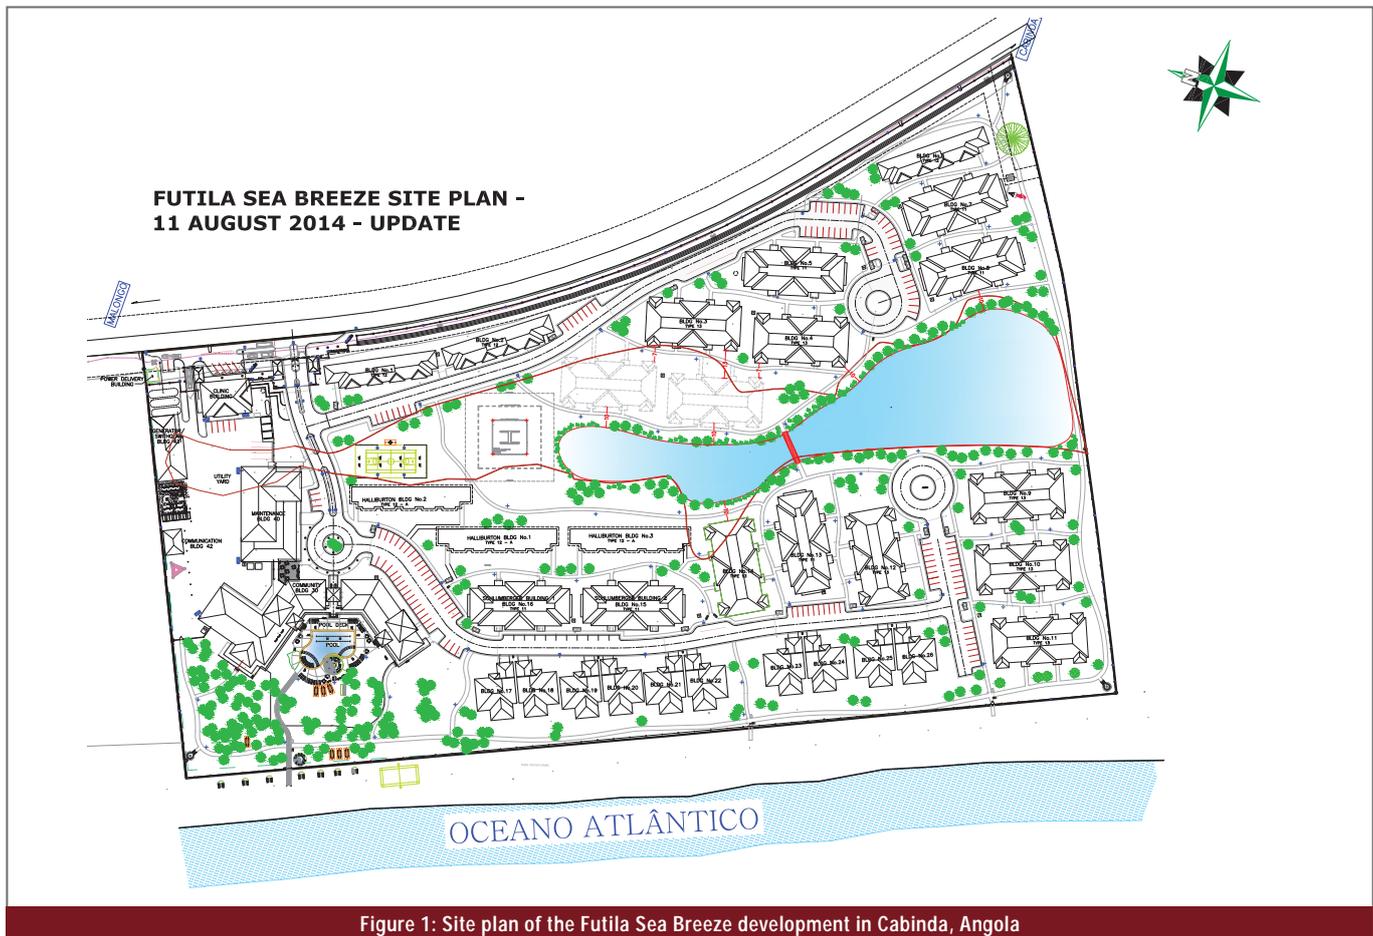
Site plan of the Futila Sea Breeze development in Cabinda, Angola
